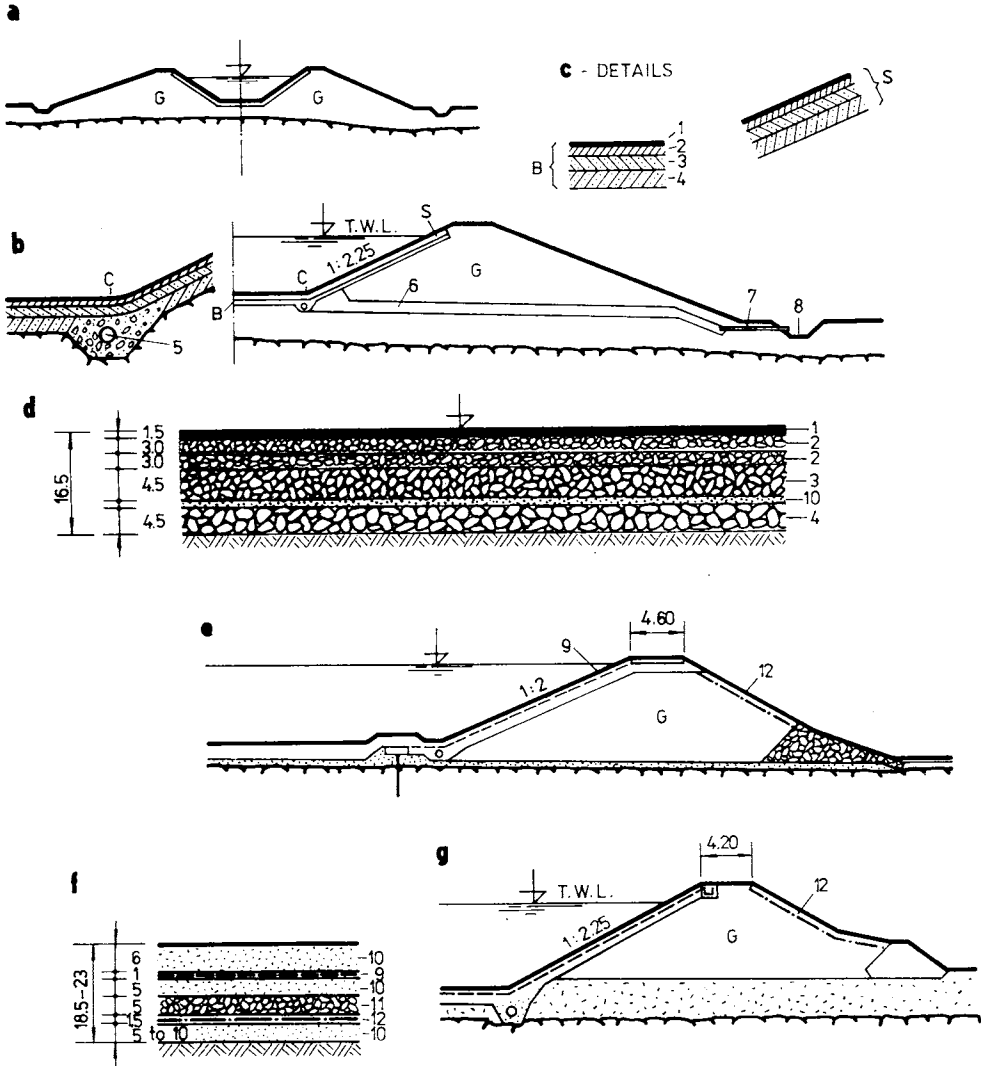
Sealing apron. a — canal embankment and sealing, b — upstream and bottom sealing with drainage, c — bottom and slope details, d — asphalt-concrete layers on the bottom, e — sealing fail, f — details of the bottom, g — fail protecting slope and the bottom; 1 — watertight layer, 2 — bituminous lining, 3 — asphalt concrete, 4 — concrete, 5 — drainage pipe, 6 — gravel, 7 — pipe, 8 — ditch, 9 — watertight (plastic) foil, 10 — sand, 11 — gravel layer, 12 — textile fabric.
